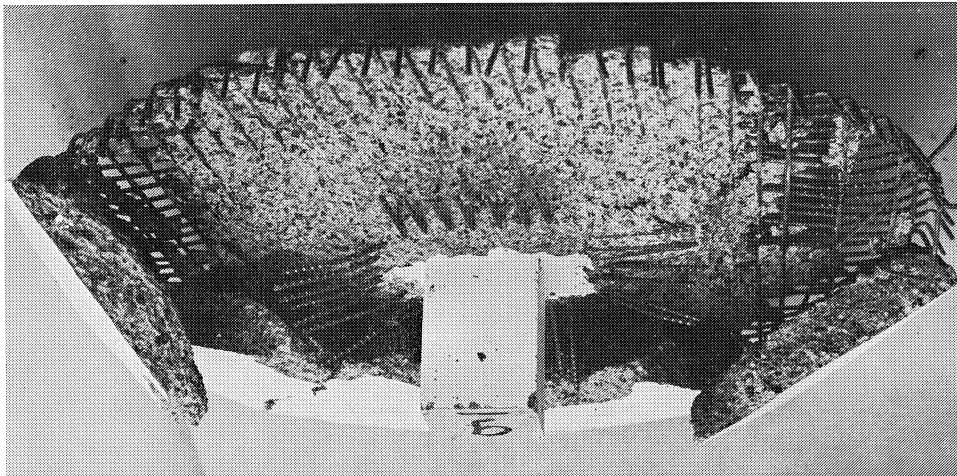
Underside of specimen II-9 (with inclined punching shear reinforcement) after loading to failure.
